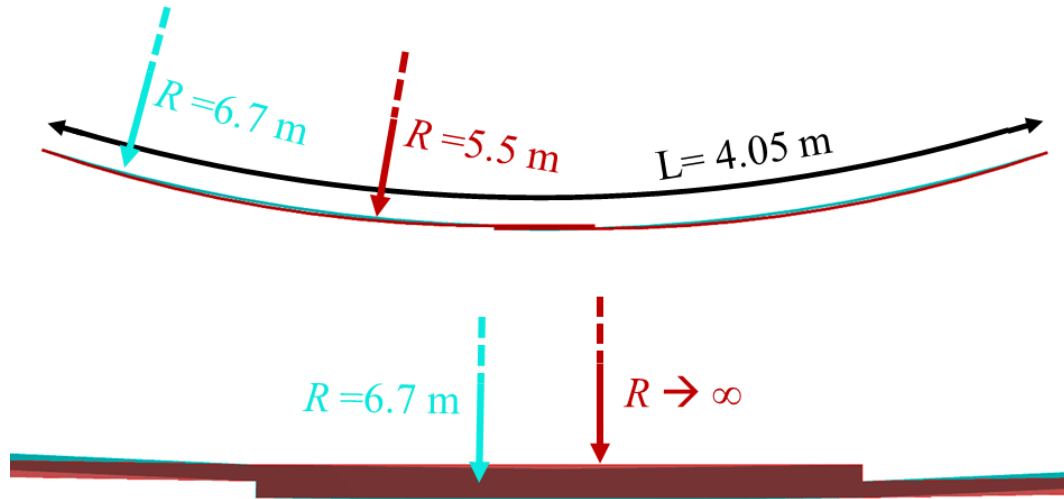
Sketch of a 400 mm long RW joint for the DEMO TF in bent and straight geometry.
